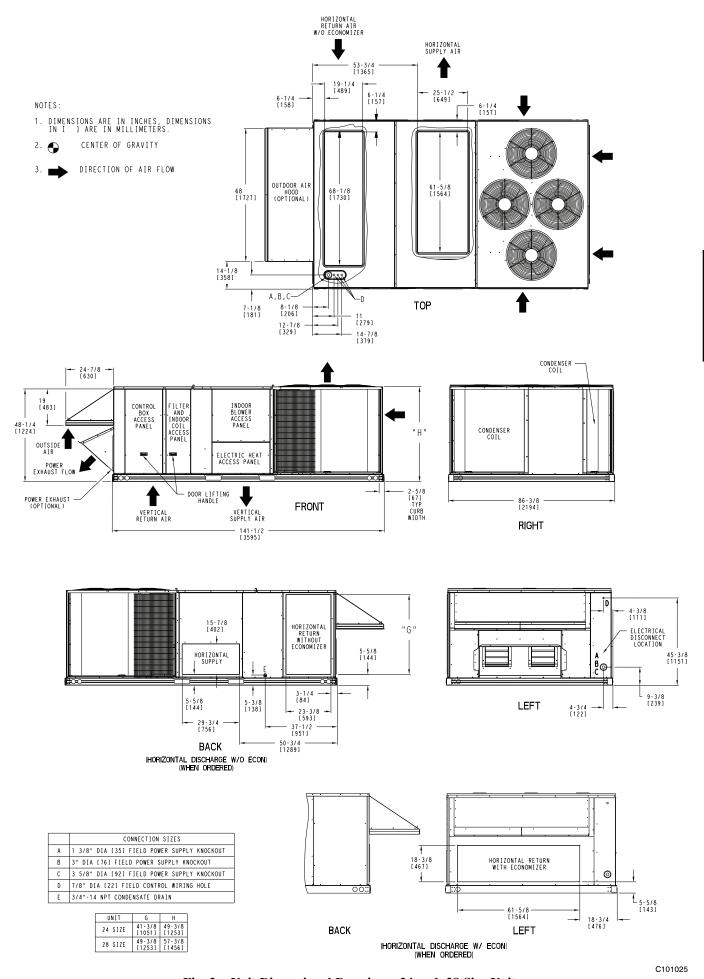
Unit Dimensional Drawing – 24 and 28 Size Units
